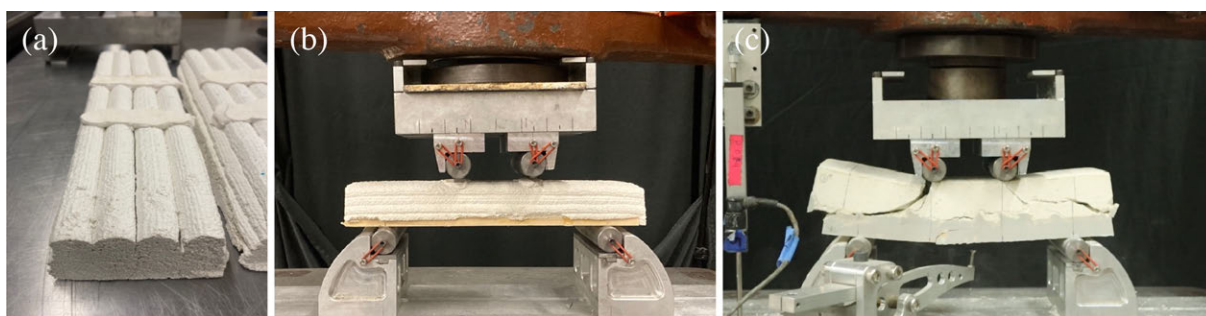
Flexural testing of hybrid timber-concrete specimens with (a,b) 3D printed concrete layers and (c) cast concrete layer, showing diagonal shear failure modes.
